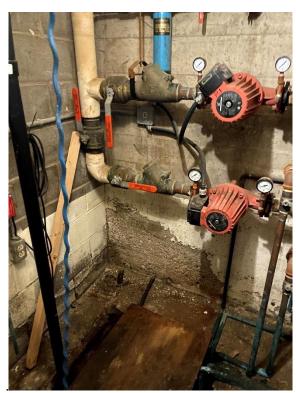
Moisture Infiltration Evident Near Base of Foundation Walls
